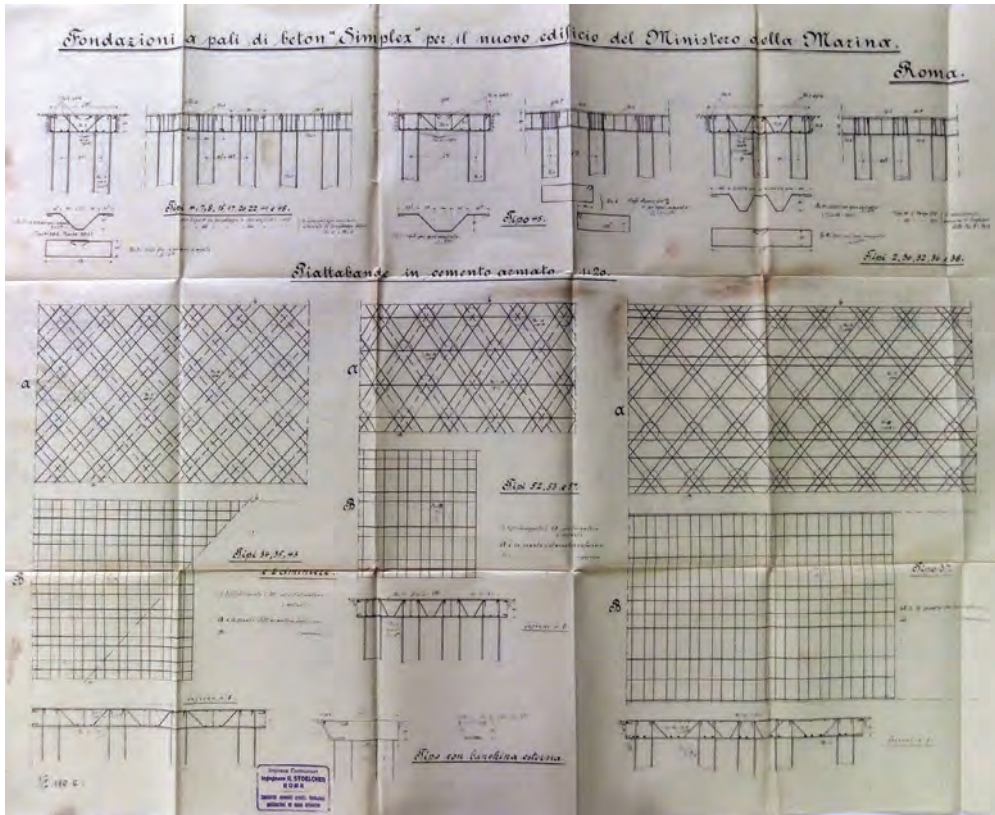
Rome, Ministry of the Navy, Simplex concrete piles; details related to the reinforced bars.
